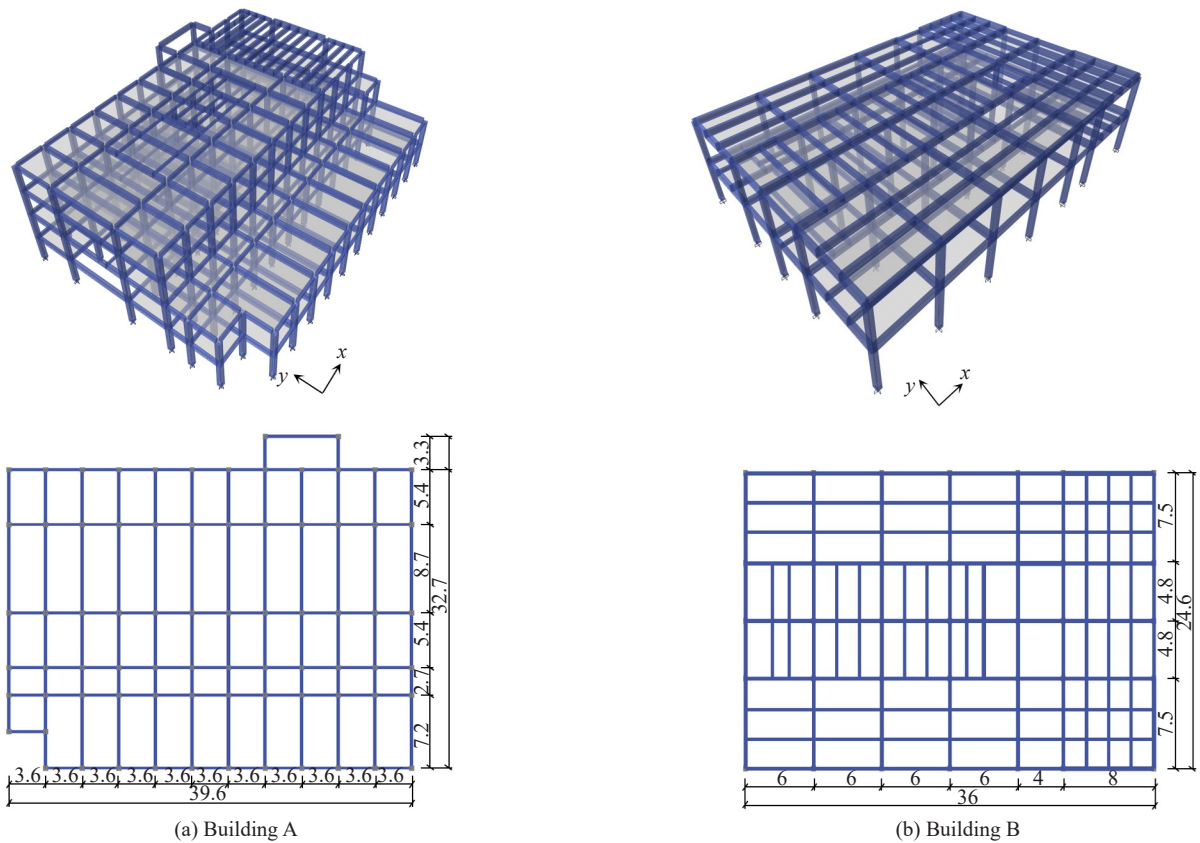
Three-dimensional and planar views of Building A and Building B (unit: m)
